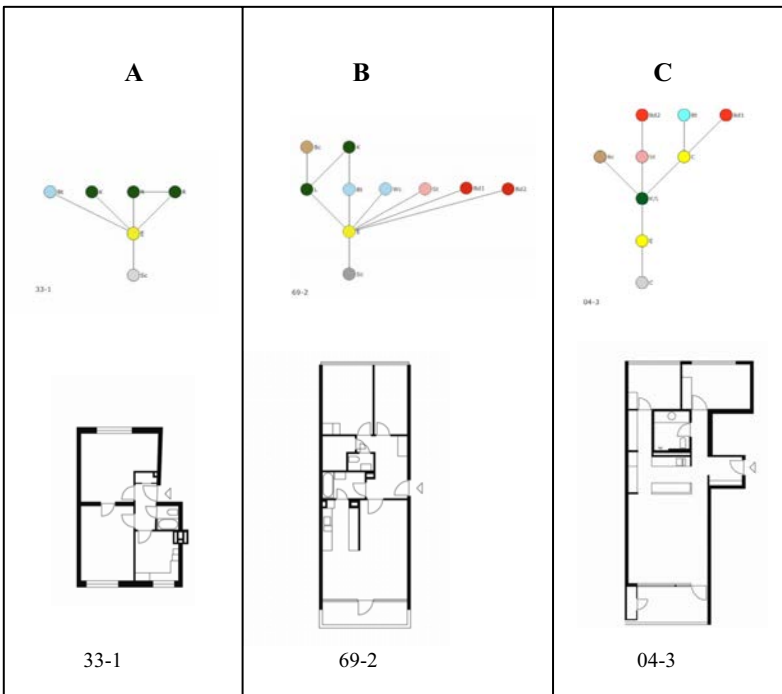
Apartments representing the three types of layouts, floor plans and justified connectivity graphs.
